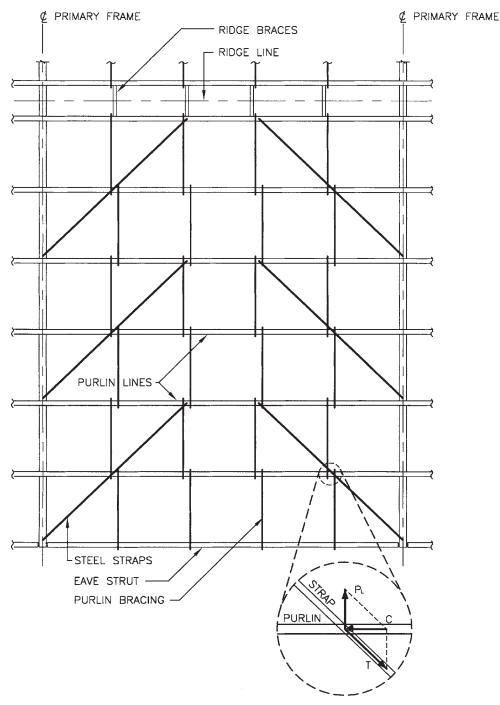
Purlin bracing by diagonal steel straps located above top flange of the purlins.
